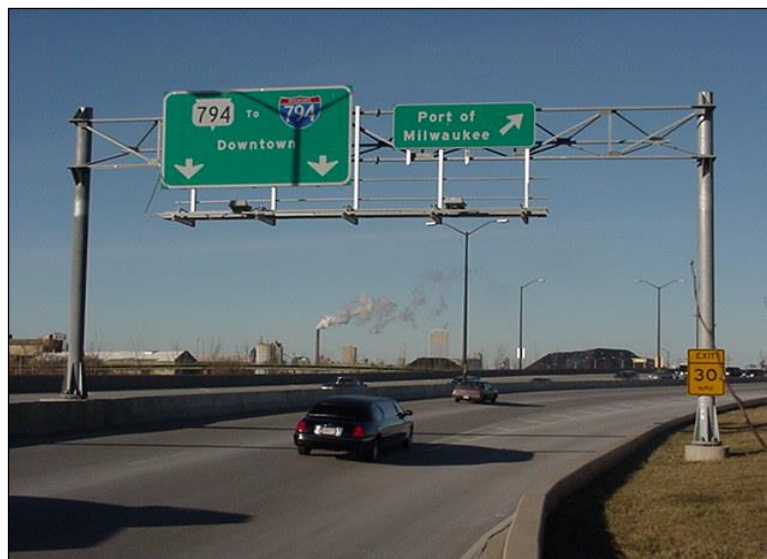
Typical Tri-Chord Sign Bridge.
